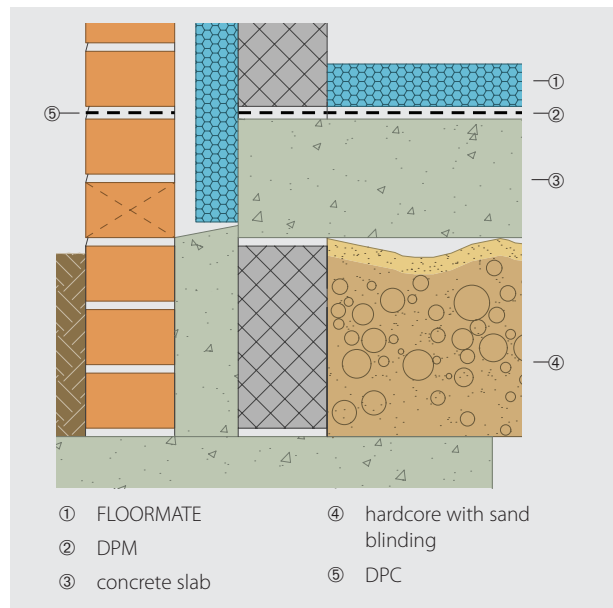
>> FLOORMATE boards over cast in-situ concrete
